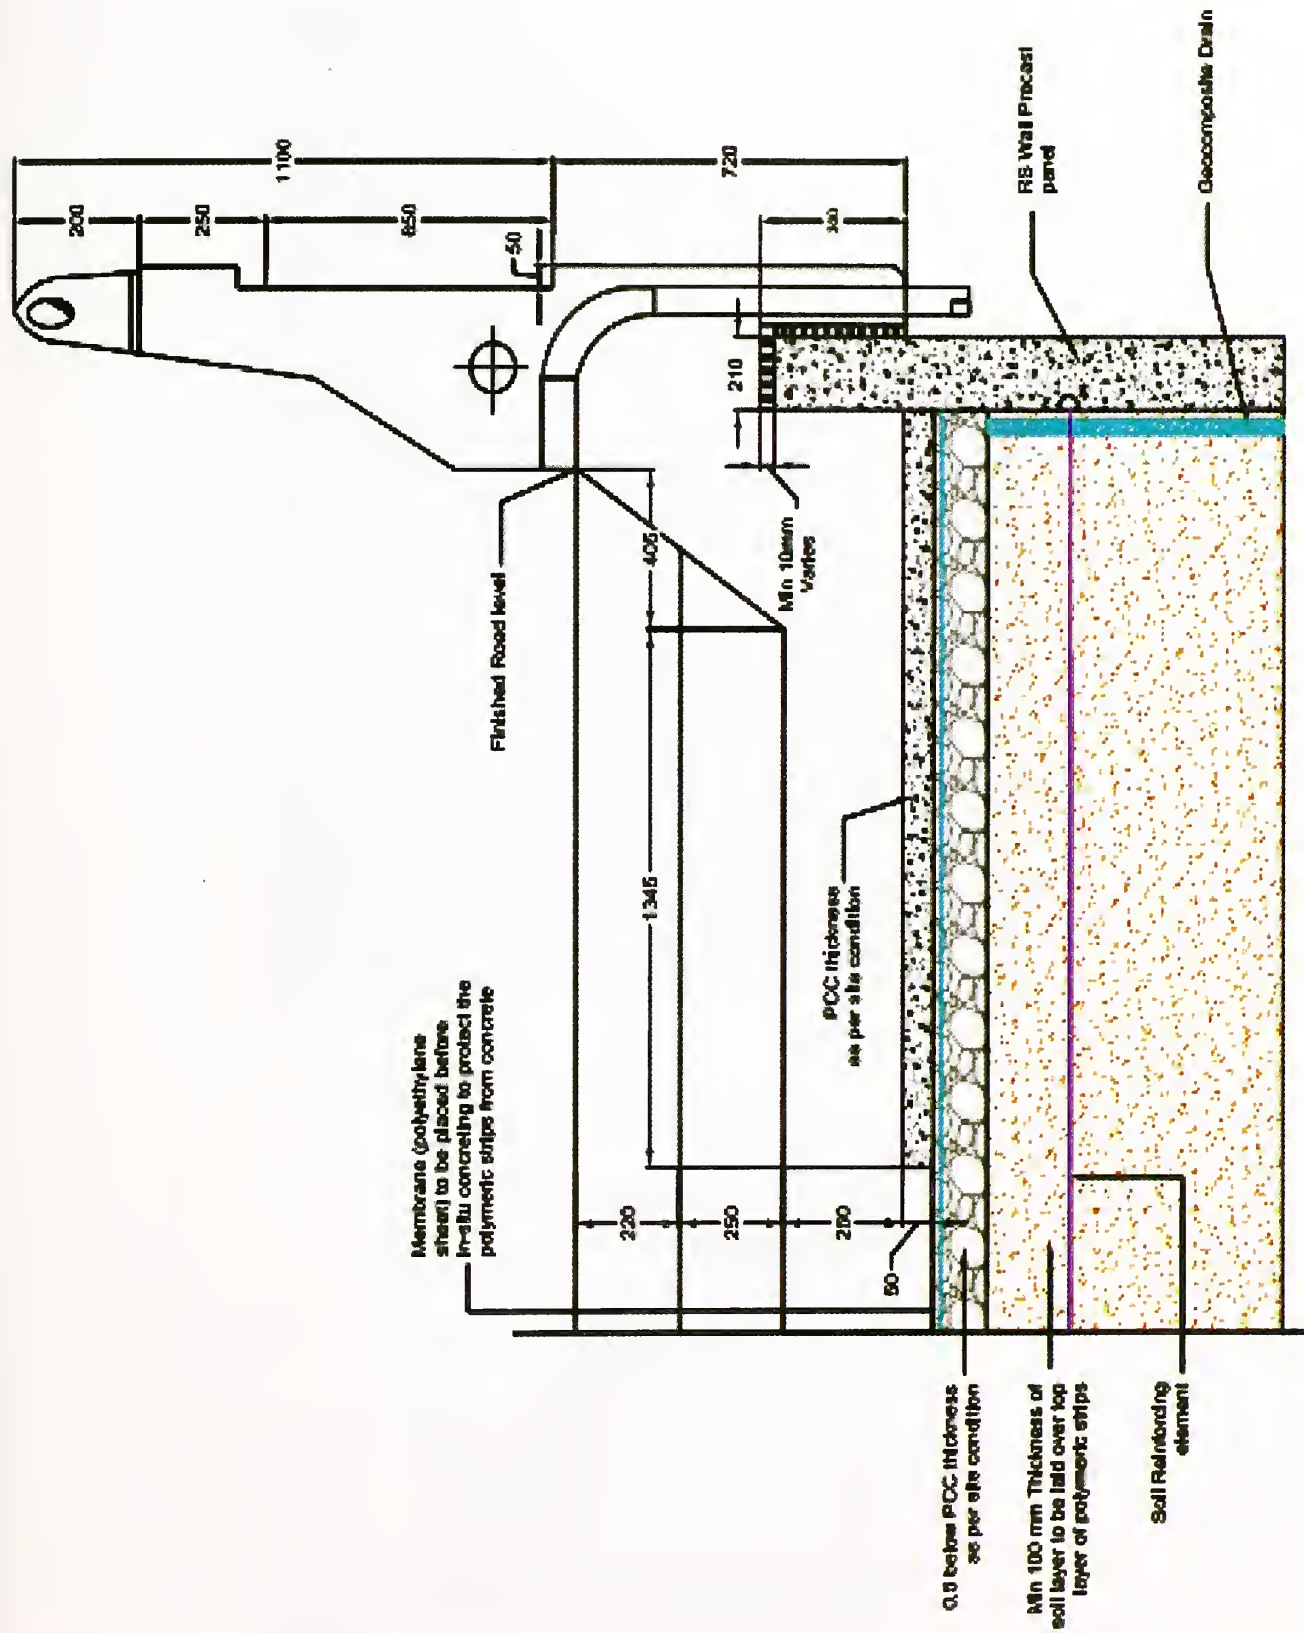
(b) Drainage Arrangement at the Top of Wall-Typical Detail for a Full Height Wall with Drainage Composite
